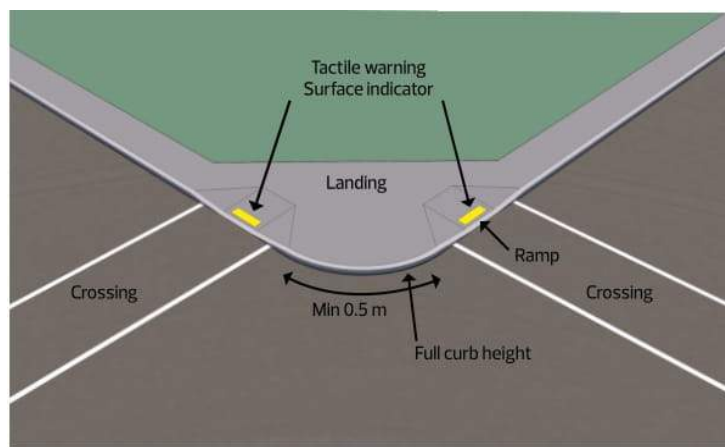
Perpendicular Curb Ramps Monolithic Sidewalk
